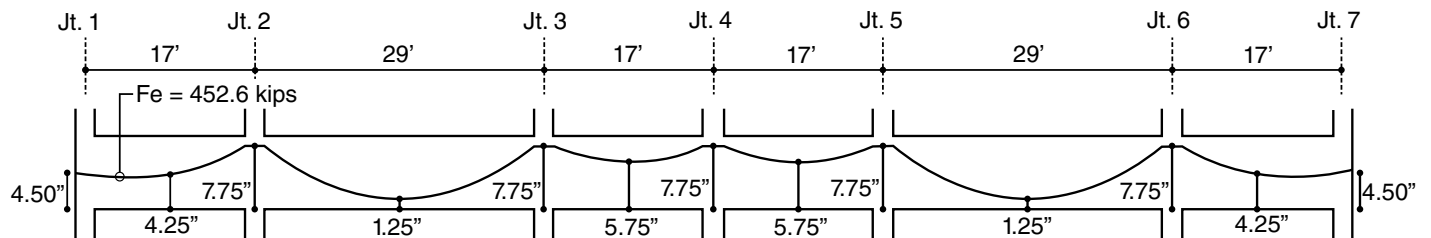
Draped strands can provide constructability solutions for transfer girders. Define strand drapes by providing dimensions from the soffit to the strand center of gravity at each support and at midspan of each span. (Image courtesy of PTI.)
